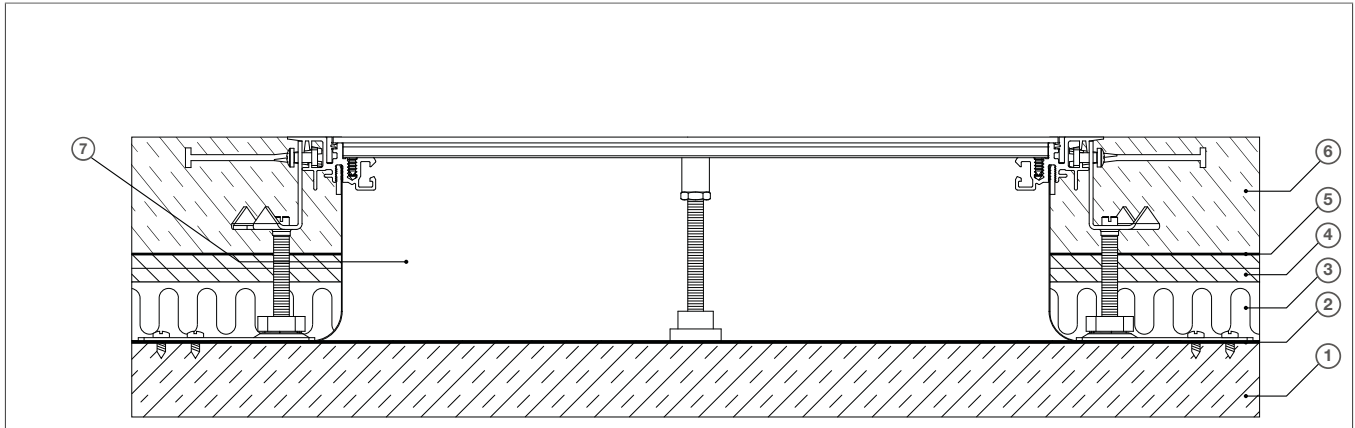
Concept drawing of the test setup for the BKFx screed-flush trunking on the ceiling test station
